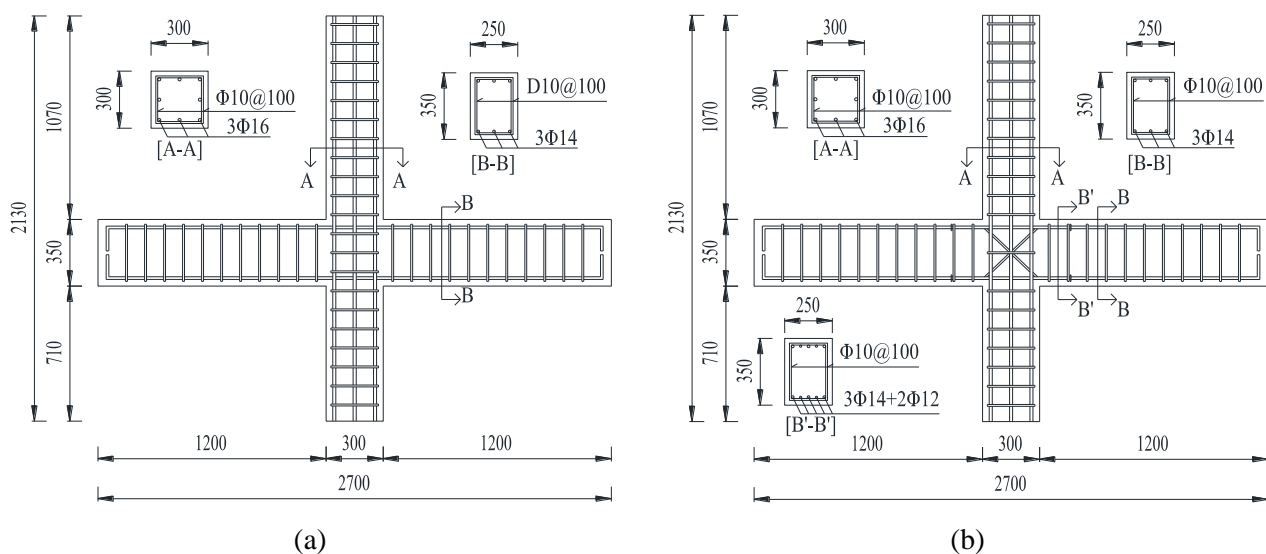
Geometry and reinforcement of specimens (a) BCJ-S and (b) BCJ-D
